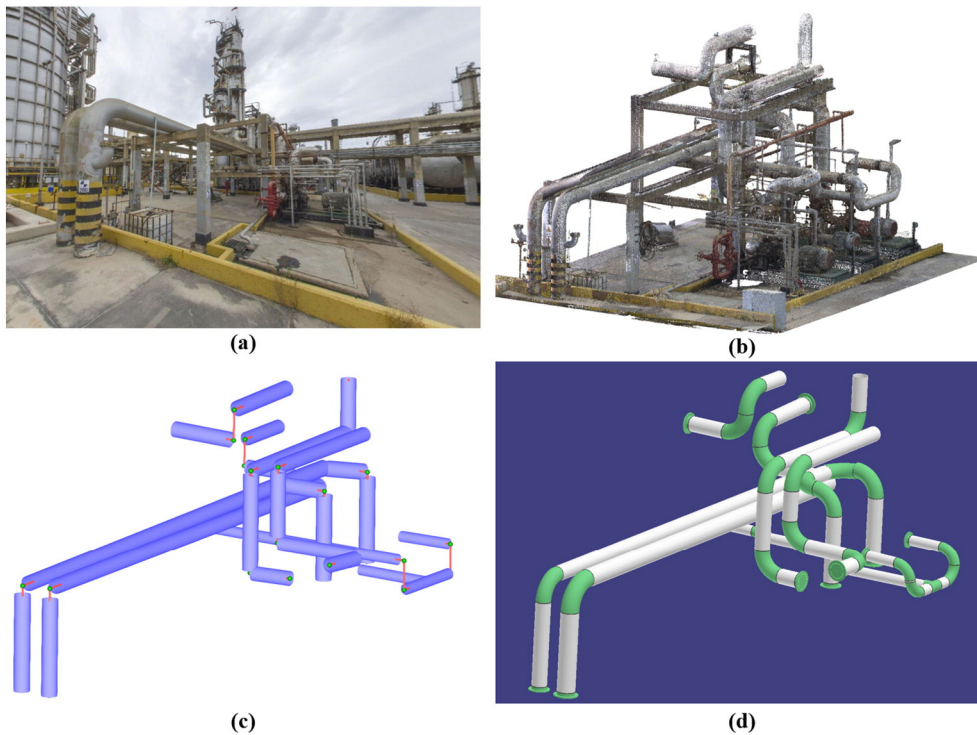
Pipe plant reconstruction: (a) original plant, (b) laser-scanned point clouds, (c) cylinder detection and network reconstruction, (d) reconstructed pipelines in SP3D.
